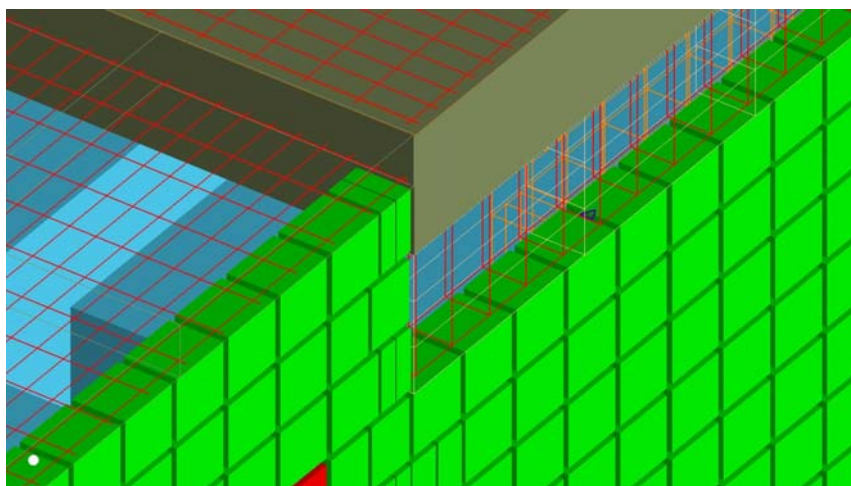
Precast prestressed concrete slabs (in grey) with a reinforced cast in-situ concrete topping and bearing over a reinforced concrete spreader beam at the wall supports, with no reinforced connection between the spreader beam and the precast slabs.
